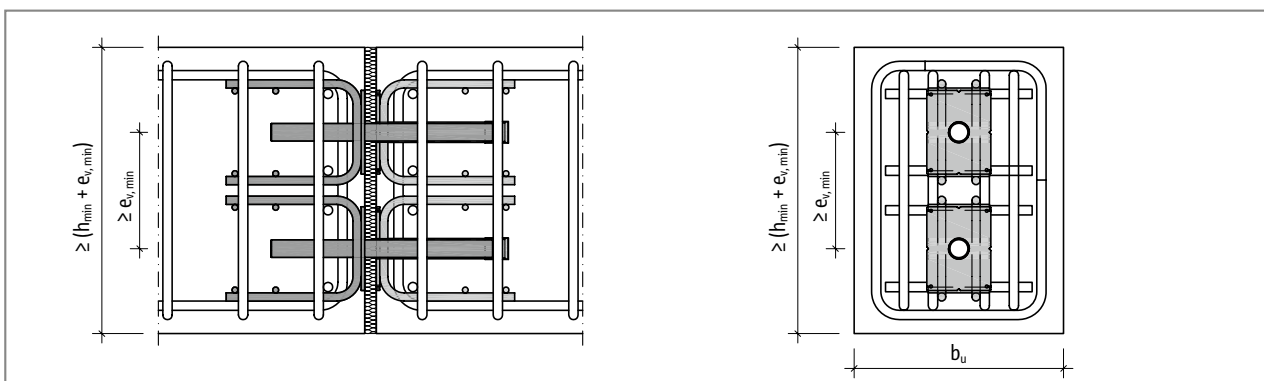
Schöck Dorn type SLD-Q: On-site reinforcement for beam connection
